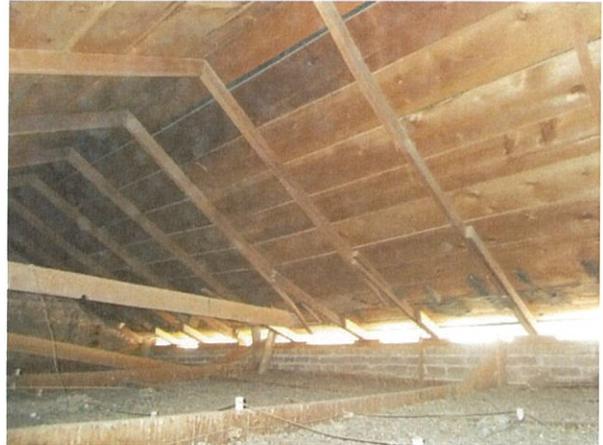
View of roof structure at west side. Approximately 20% of the roof requires rebuilding.
